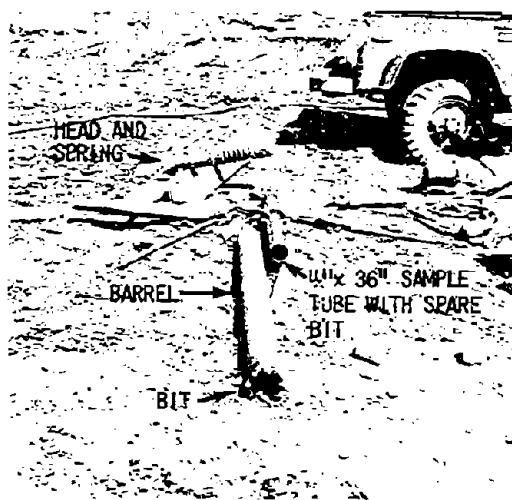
PHOTO D. PITCHER BARREL USED ON HOLE S-20. HERE DISASSEMBLED, PARTS LABELLED
